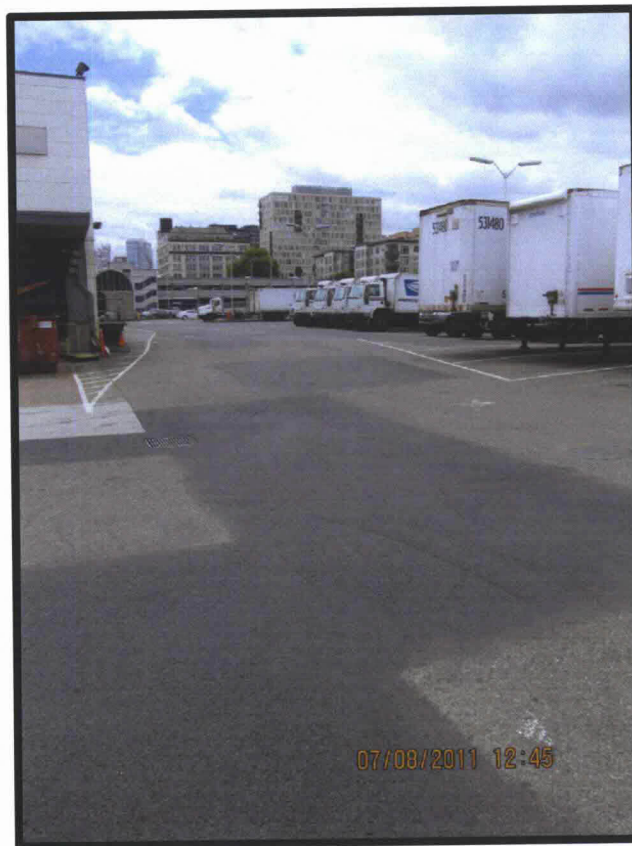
Looking southerly at pavement repair and east drive lane to VMF and north truck dock.
